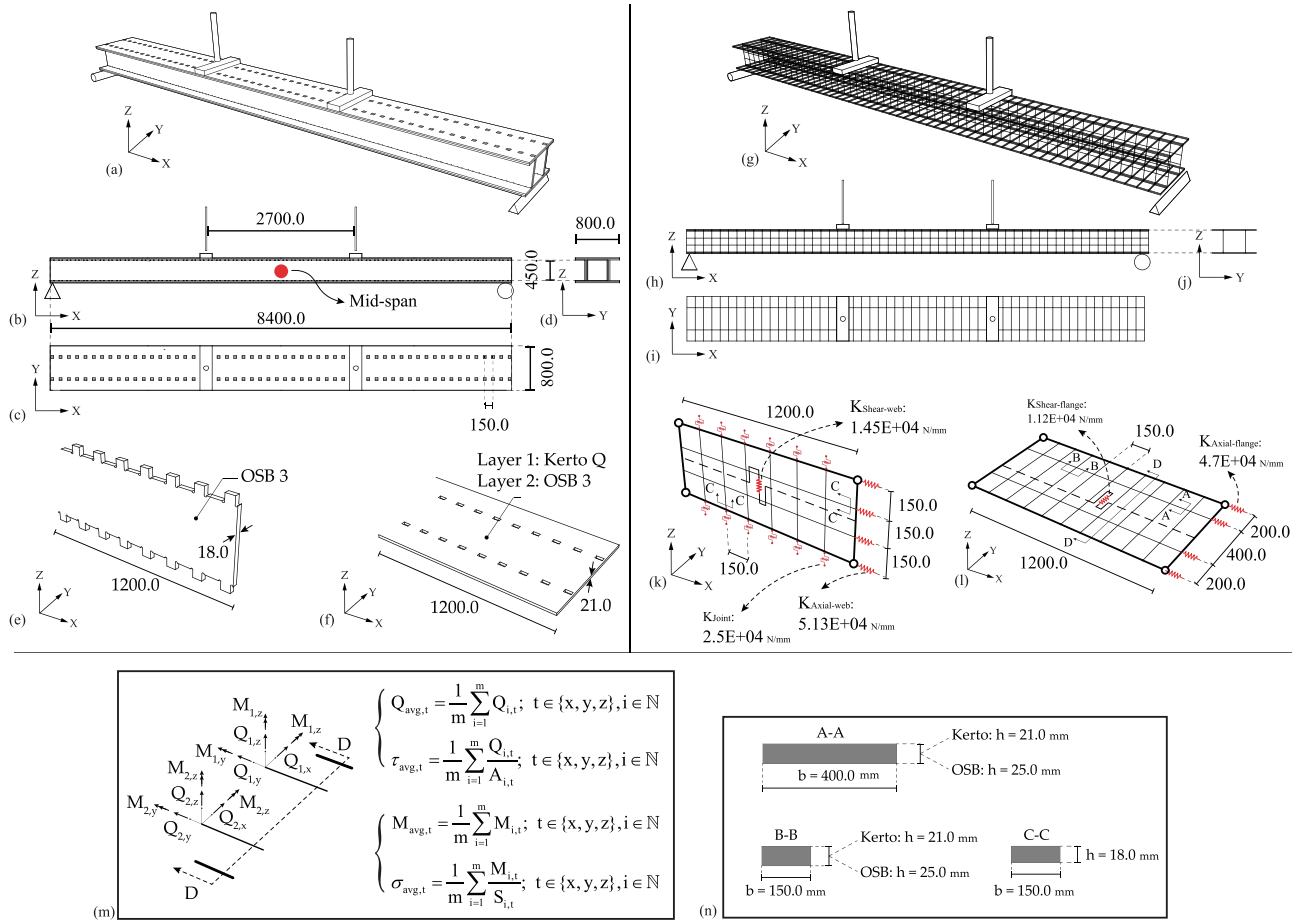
Prefabricated beams: (a) 3D perspective view of the CAD model (re-generated from [30]), (b–d) side and top views, (e) dimensions of a typical web, (f) dimension of a typical flange, (g) 3D perspective view of the CAE macro model, (h–j) side and top videws of the macro model, (k) macro model for the web, (l) macro model for the flange, (m) computation of force and stress in section D-D, (n) dimensions of sections A-A, B-B, and C-C.
